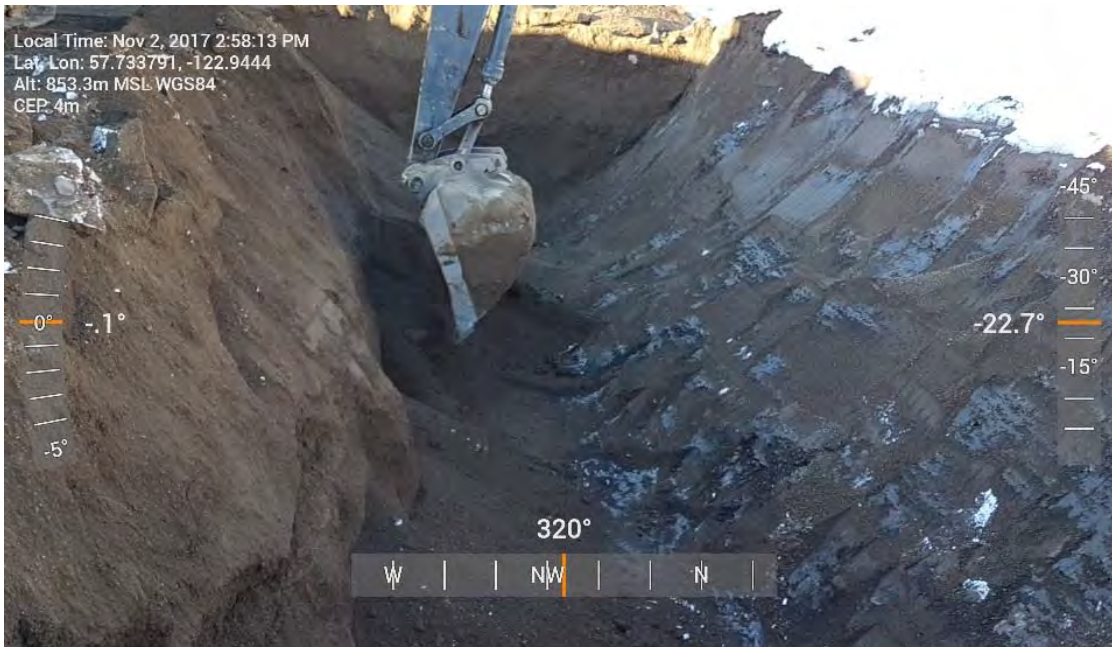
Exposing backfilled northern wall of AEC 1B in preparation of installation of poly liner looking towards the north-west.
